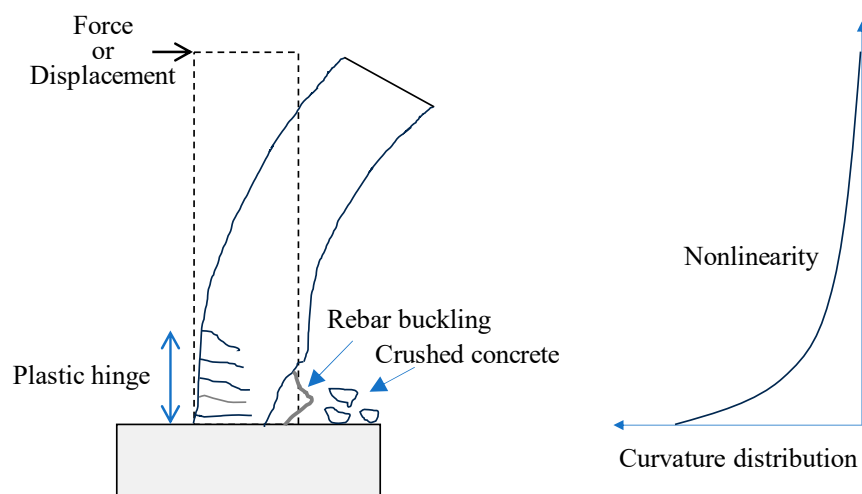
Failure of plastic hinge in RC pier or column.
